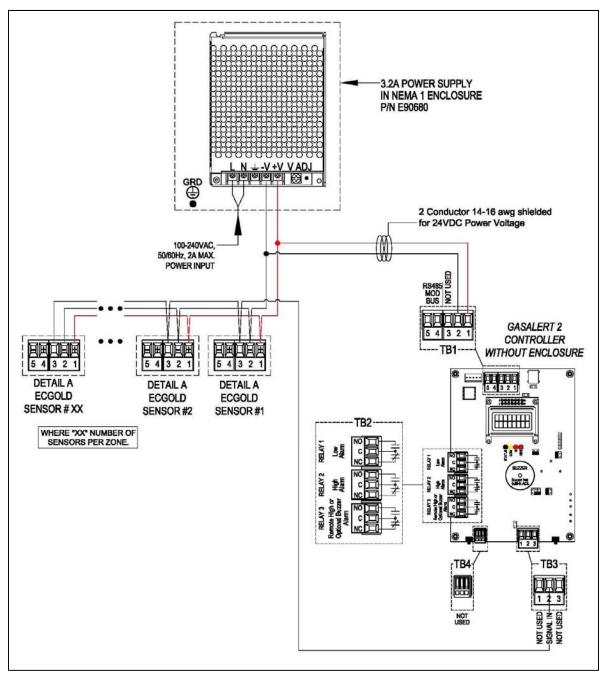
TYPICAL INSTALLATION OVERVIEW
